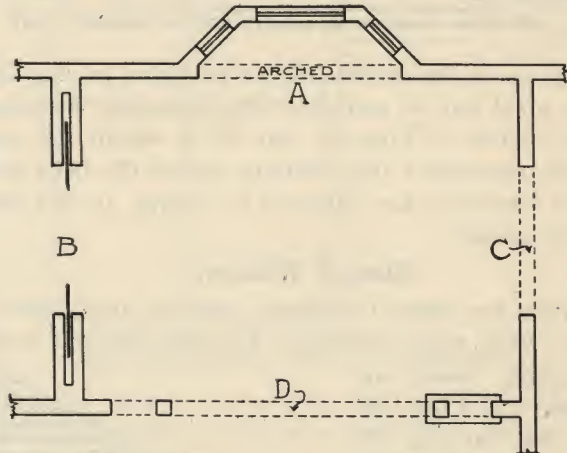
Arched, cased, colonnade and sliding door openings shown.
